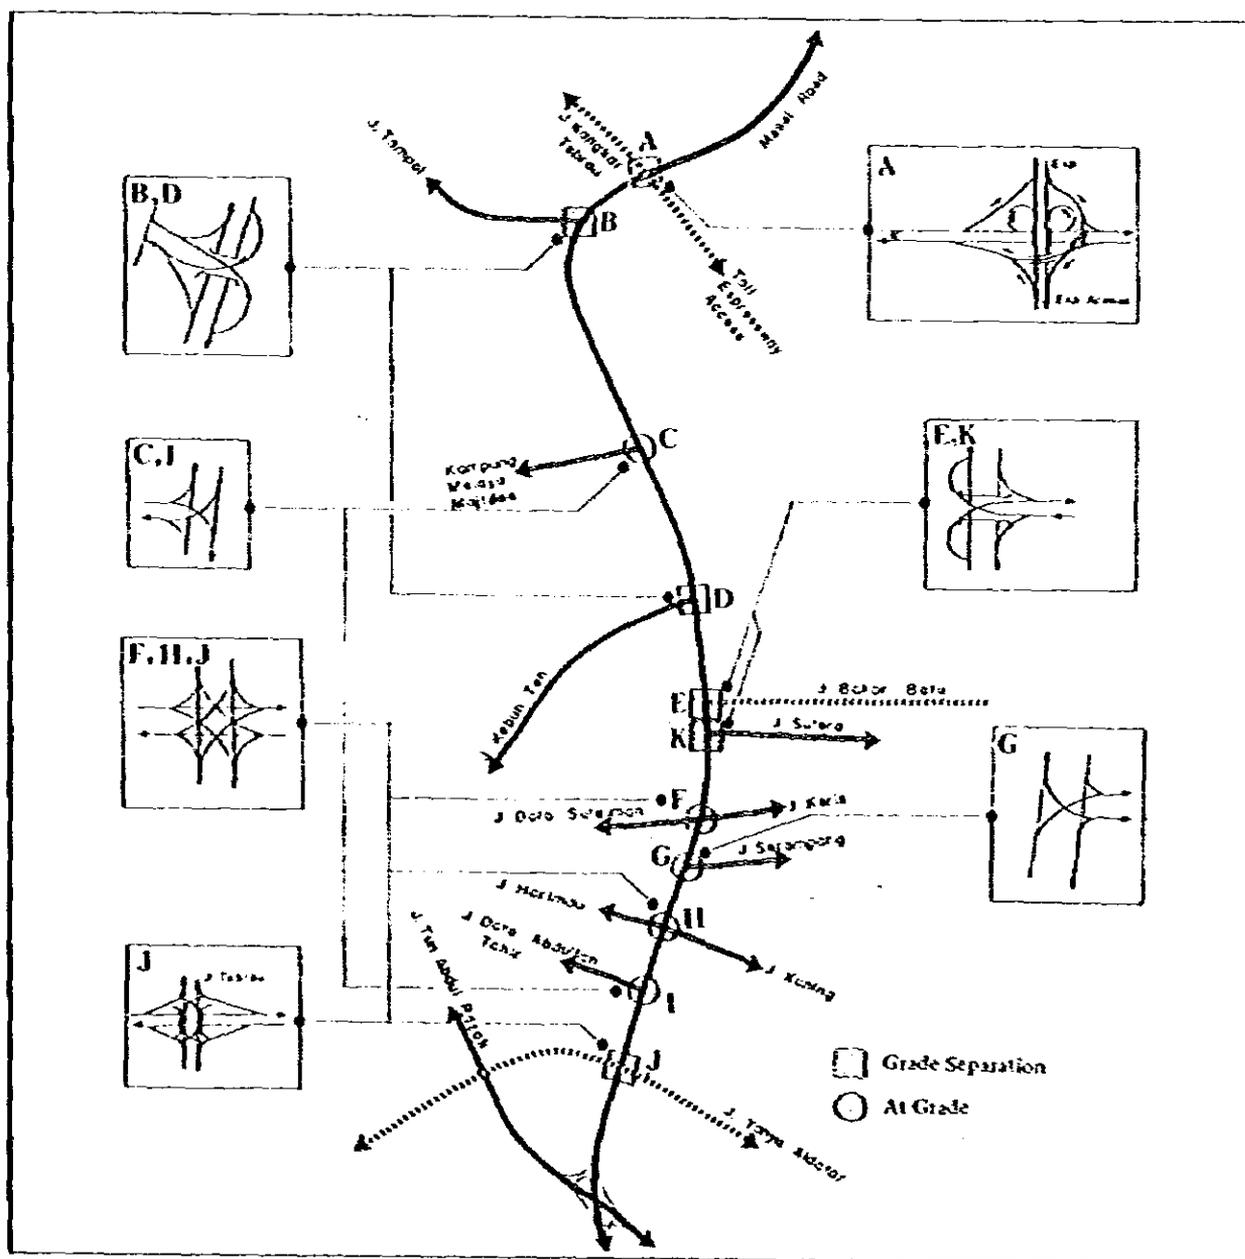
INTERSECTION/INTERCHANGE PLAN ON JALAN TEBRAU
